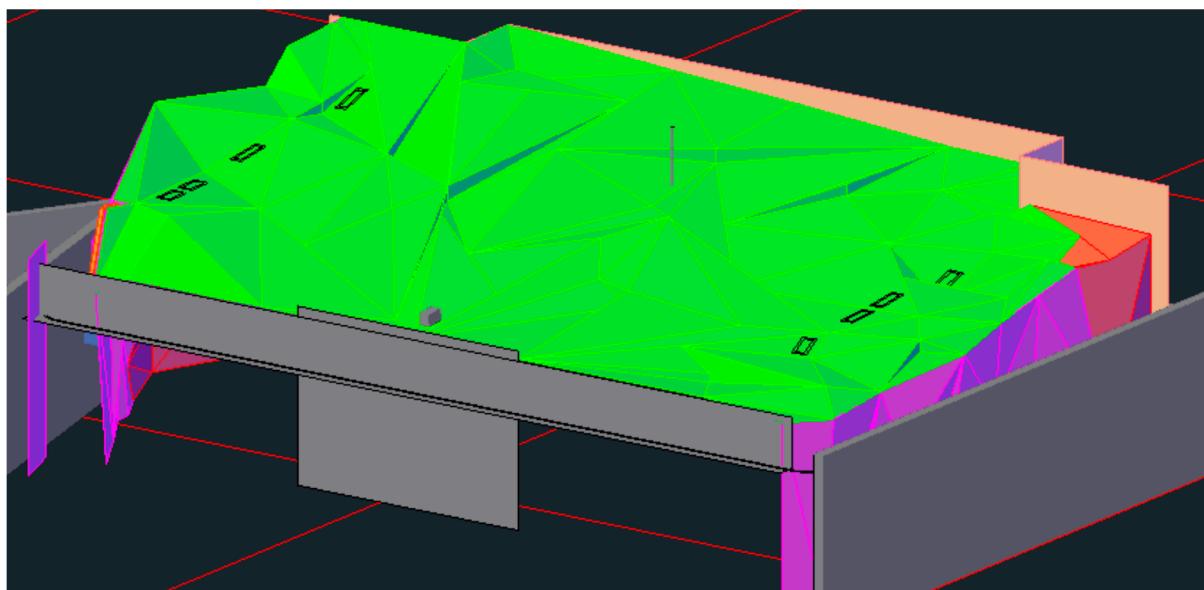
Complex Suspended Ceiling and Internal Walls of Builder C3 (Adapted from Phillip Island Nature Parks [41]).
